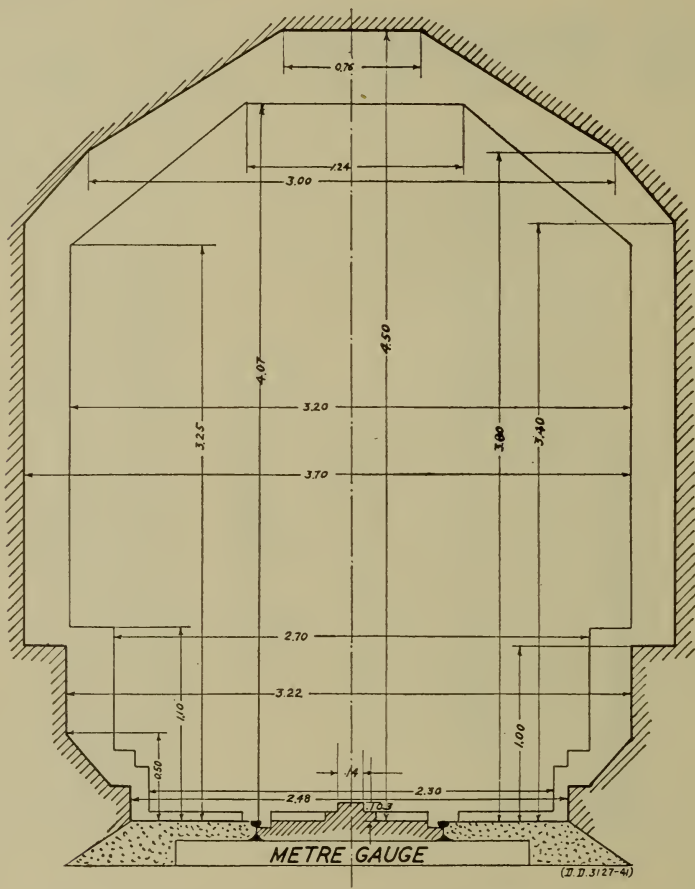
Chilean Transandine Railway, minimum construction and maximum loading gage, dimensions in meters
